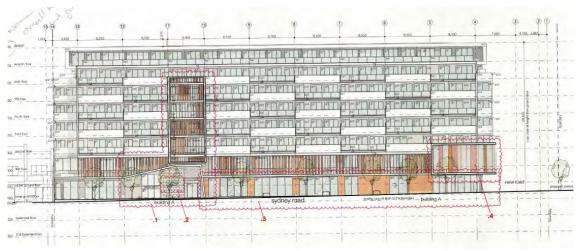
Endorsed Sydney Road elevation (Source: MPS/2011/266)
